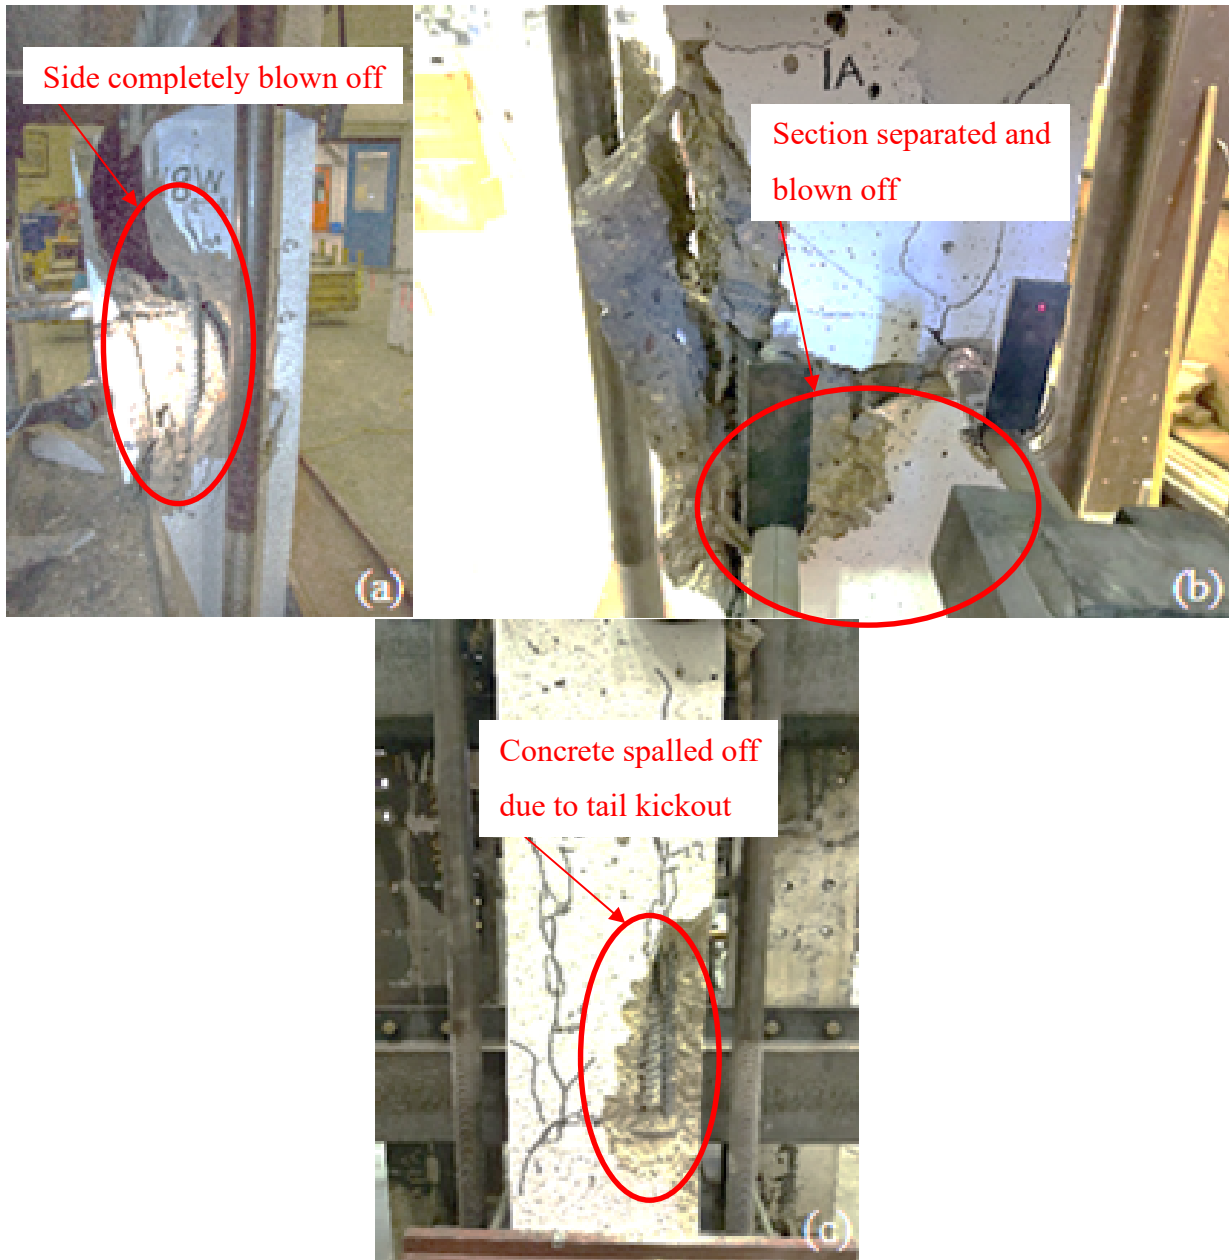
Failure modes: (a) side blowout – MD4-90, (b) front face blowout – P1-180, and (c) tail kickout – MD1-90
